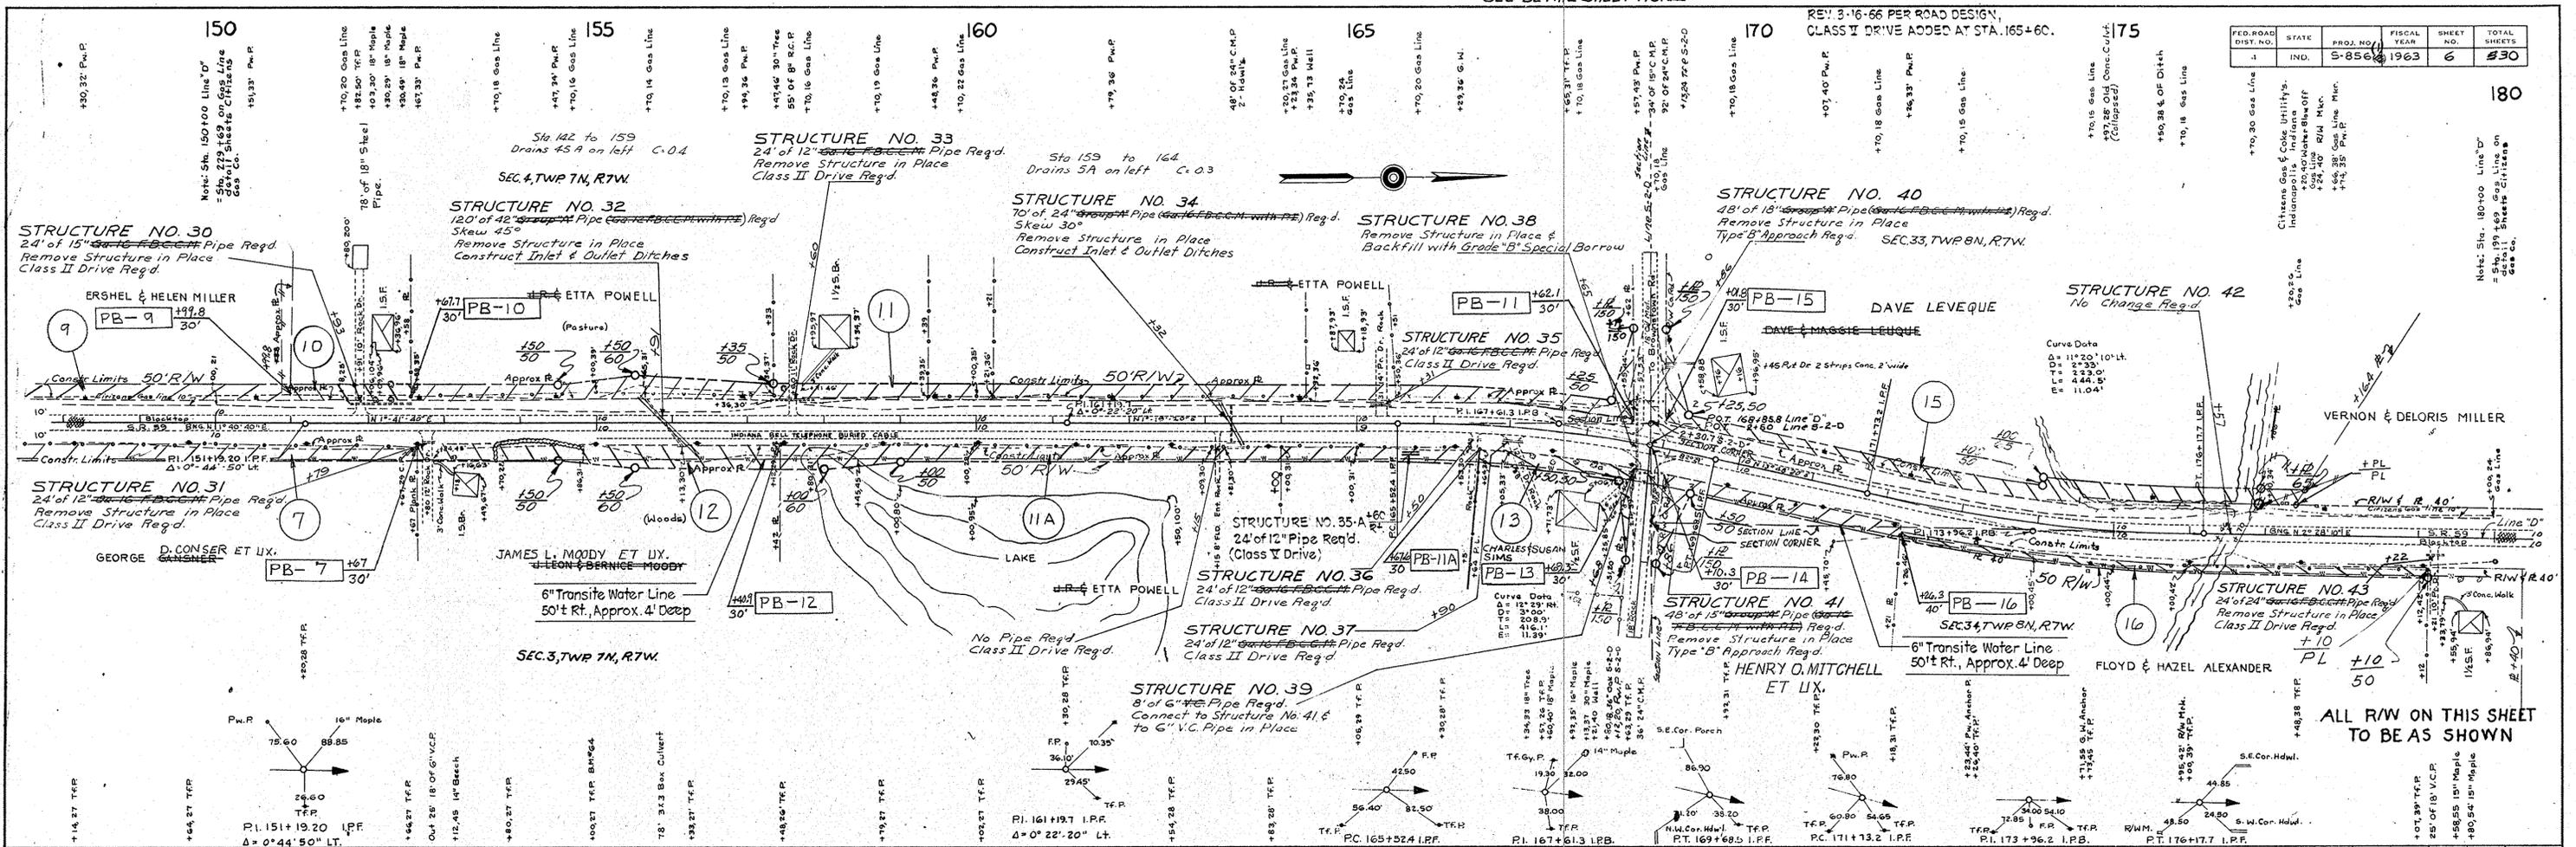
PLAN - PROFILE, R. R. STANDARD
